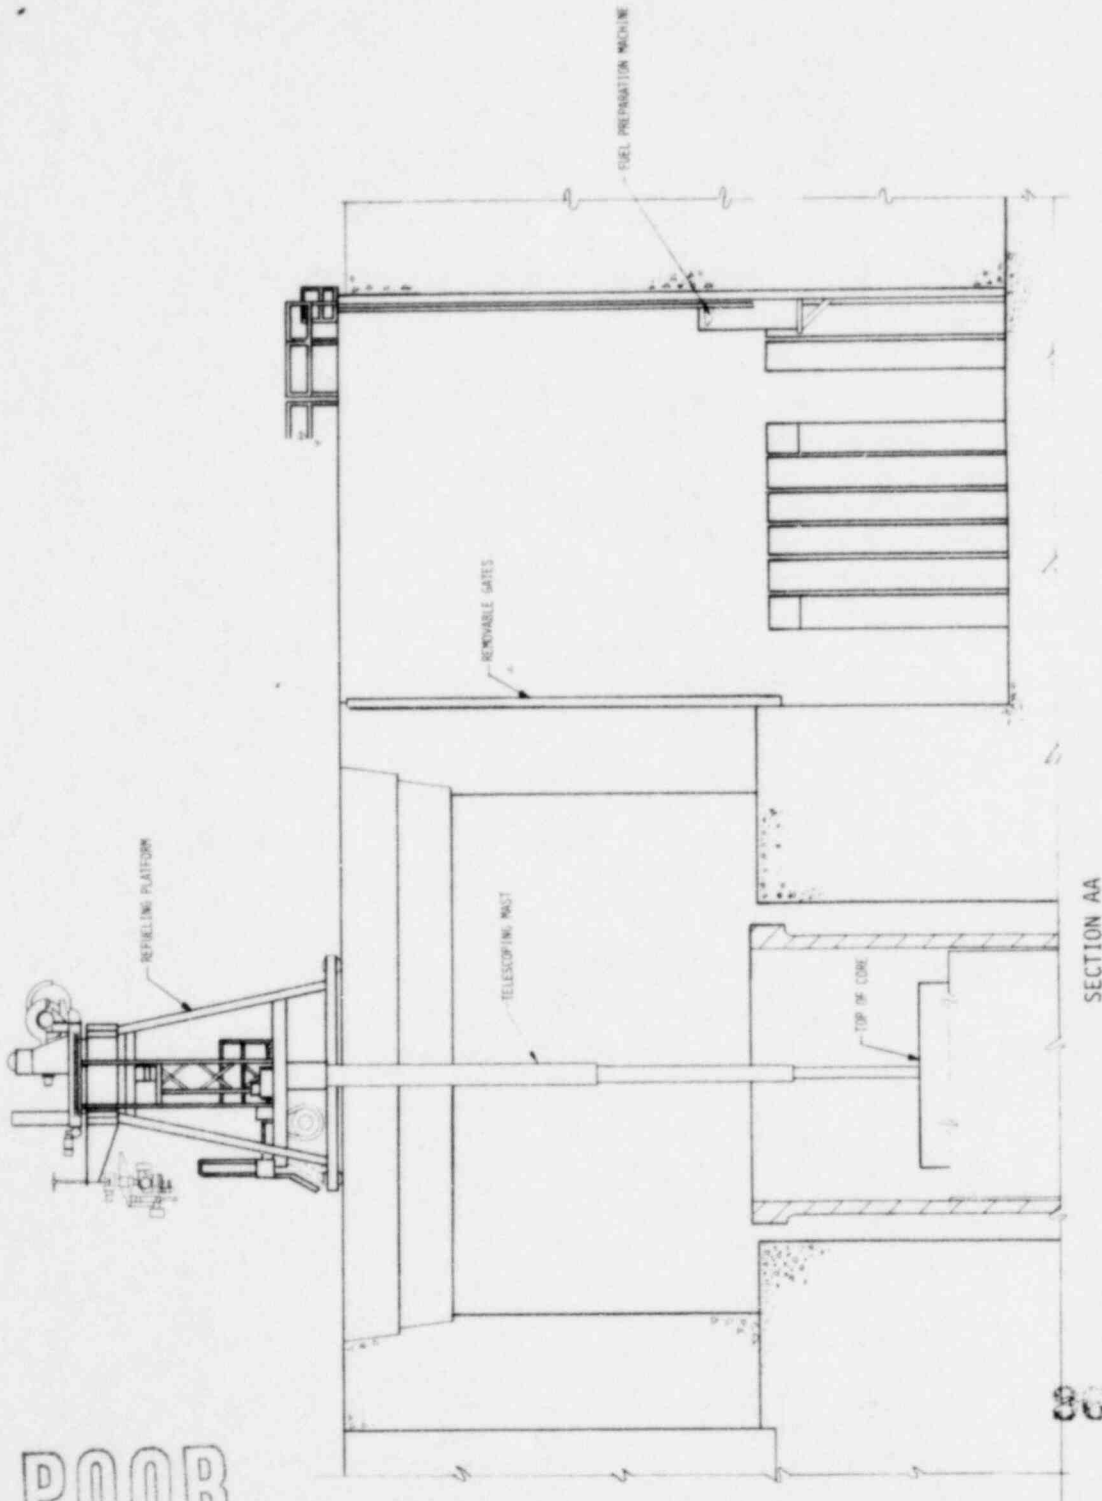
Fuel Handling Facilities Cross-Section - BWR.
